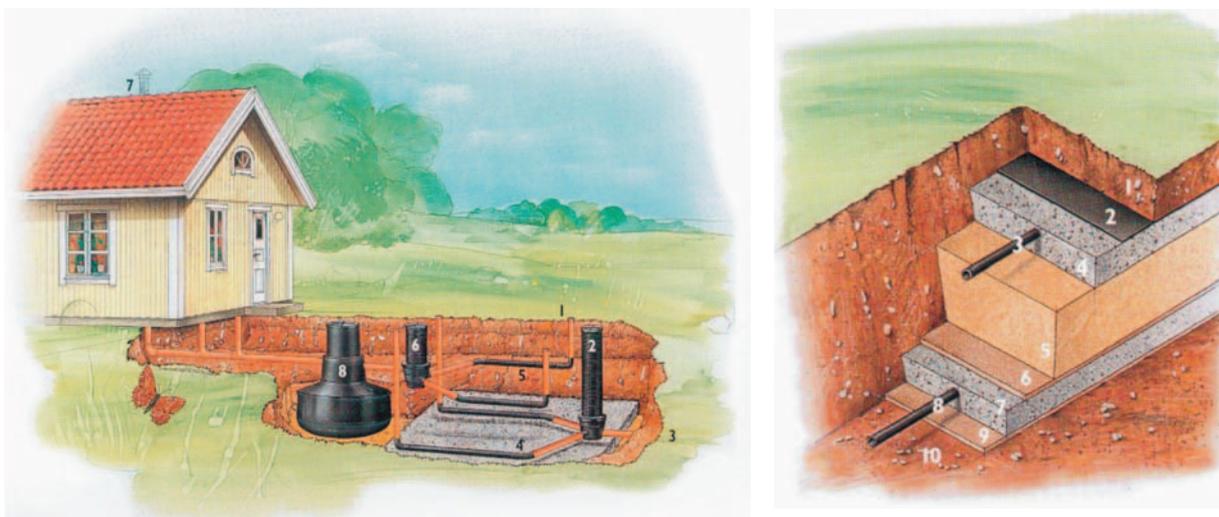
Design of a typical conventional sand filter system for onsite solution used in Sweden. Diagram to the left: 1. Flushing pipe connected to distribution pipe, 2. Collecting (measuring) well, 3. Discharge pipe, 4. Drainage pipe, 5. Distributing pipe, 6. Distributing (flow splitting) well, 7. Ventilation chimney, 8. Septic tank.
